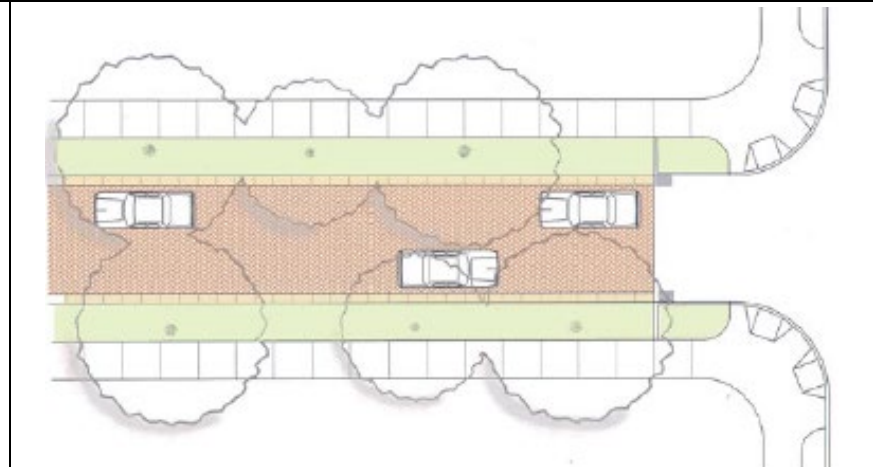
Flat Street Profile. Flat streets are designed to drain through pervious paving. While these facilities do not have a marked slope, they may be graded slightly so that they drain to the sides or center of the street when there is too much water.
